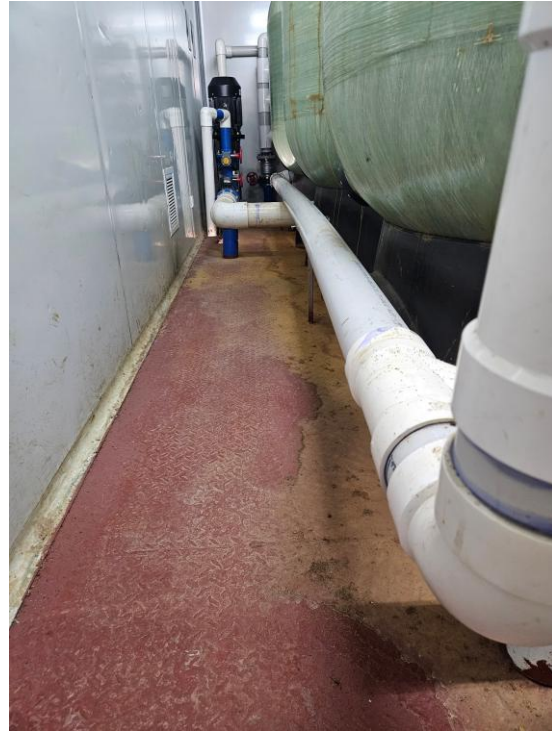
Container aisle showing restricted access between vessels and piping.
